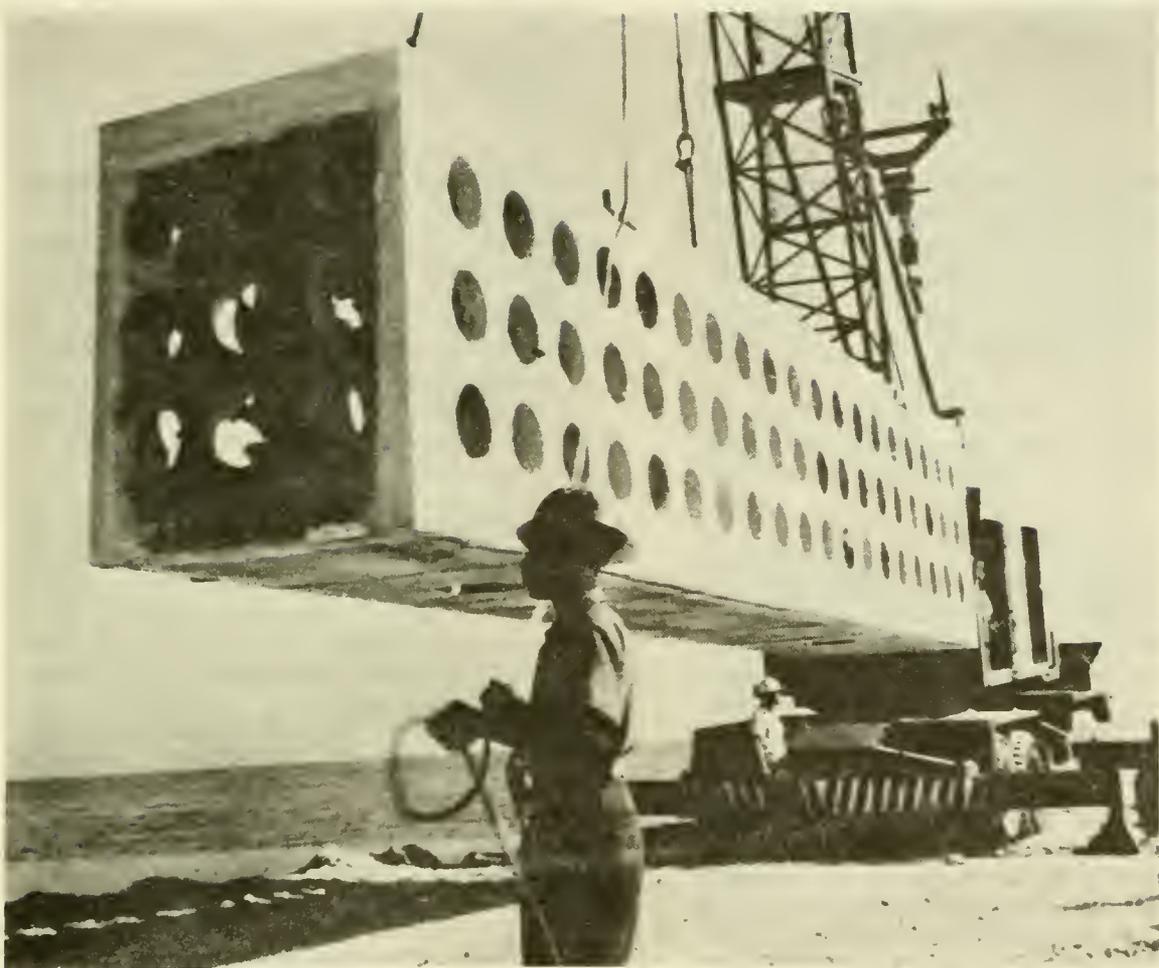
Prefabricated permeable groin. This component has also been used in the construction of breakwaters. Photograph courtesy of Portland Cement Association.
